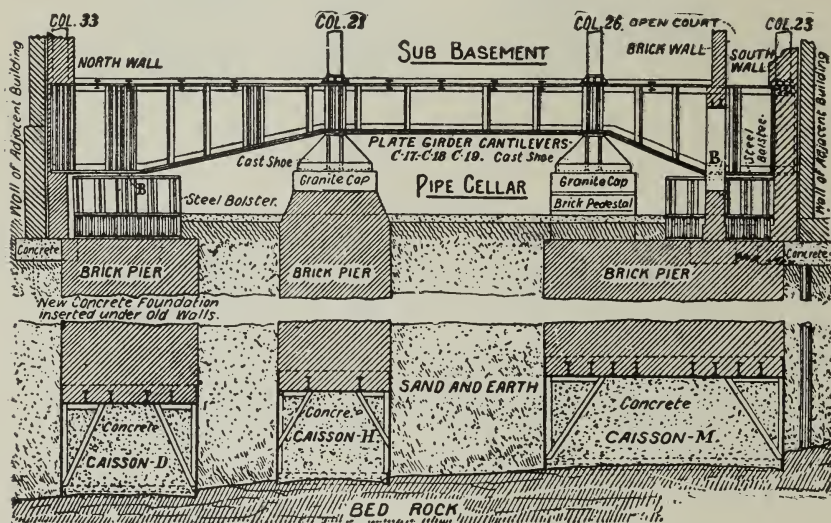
The Manhattan Life Insurance Building, New York City. Transverse Section.
